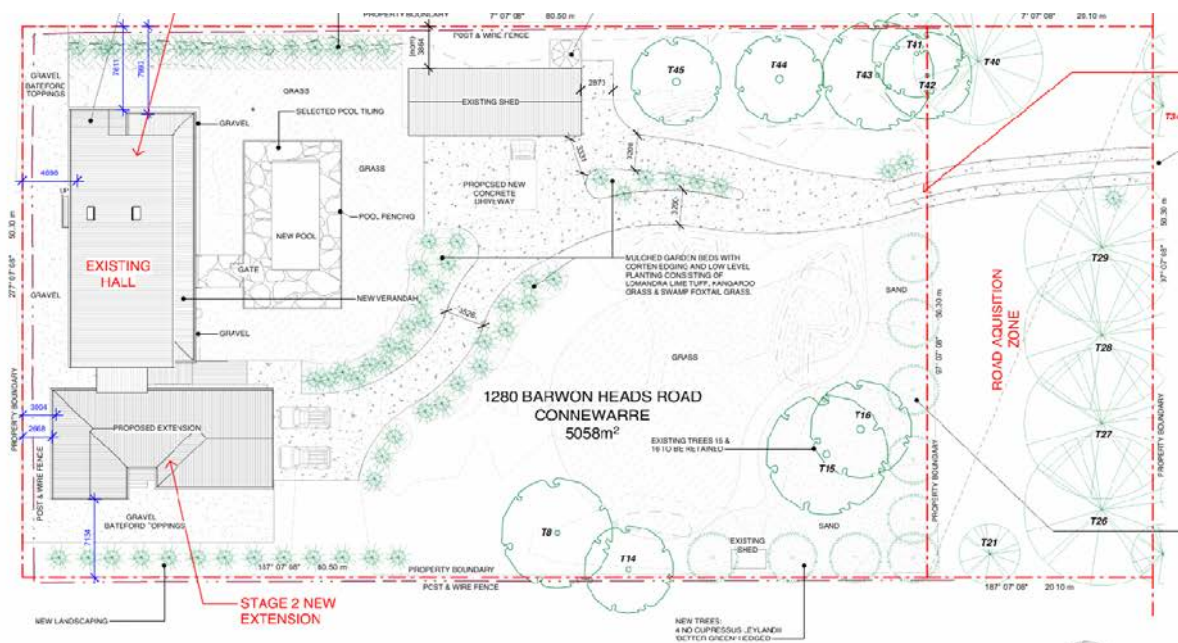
Proposed site plan showing the retained/adapted Hall, the Stage 2 extension and garage, the new pool, driveway, 10,000 L CFA water tank, landscaping and retained trees (JDA Architects, TP.07).
